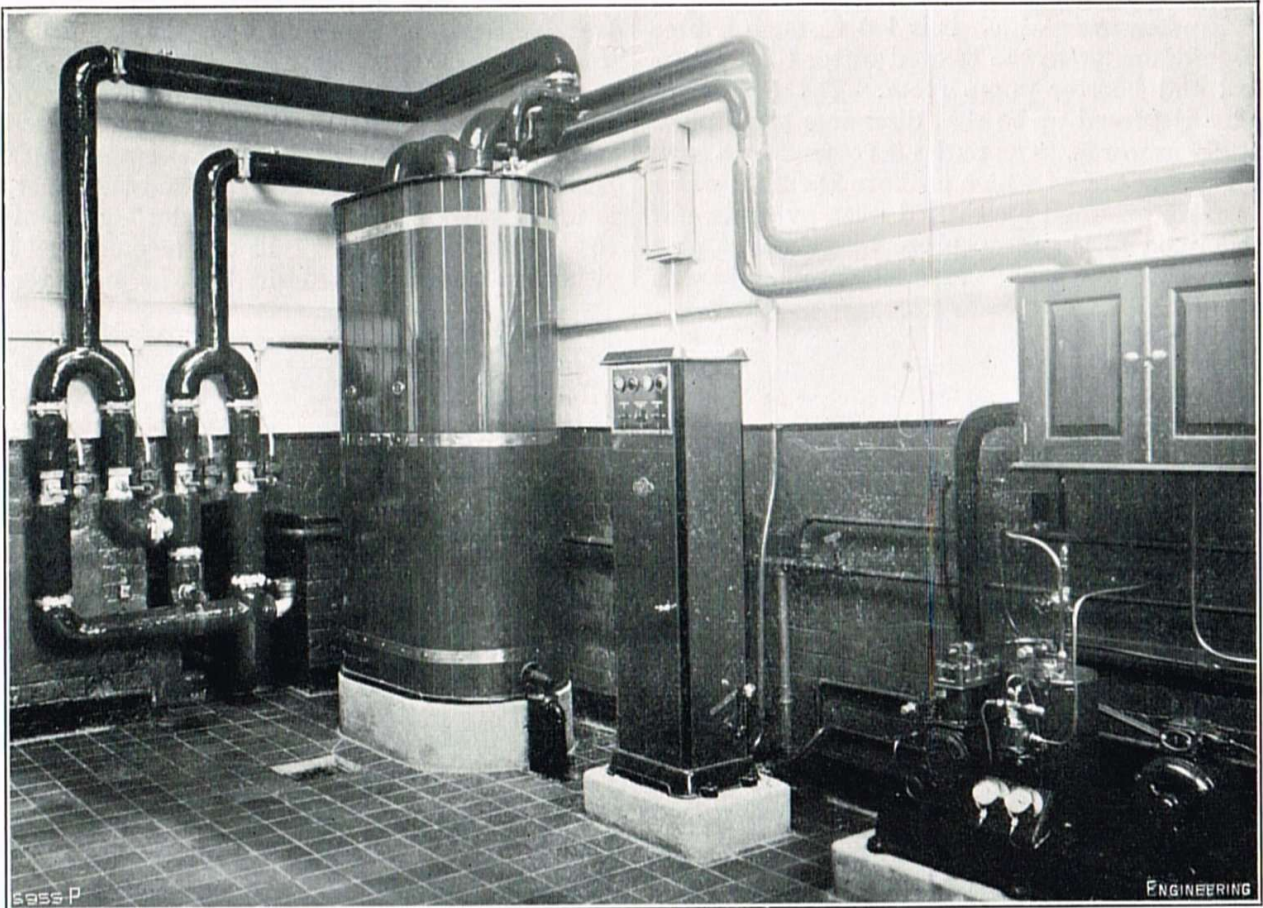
AIR COOLERS AND MOTOR-DRIVEN CONTROL VALVES.
